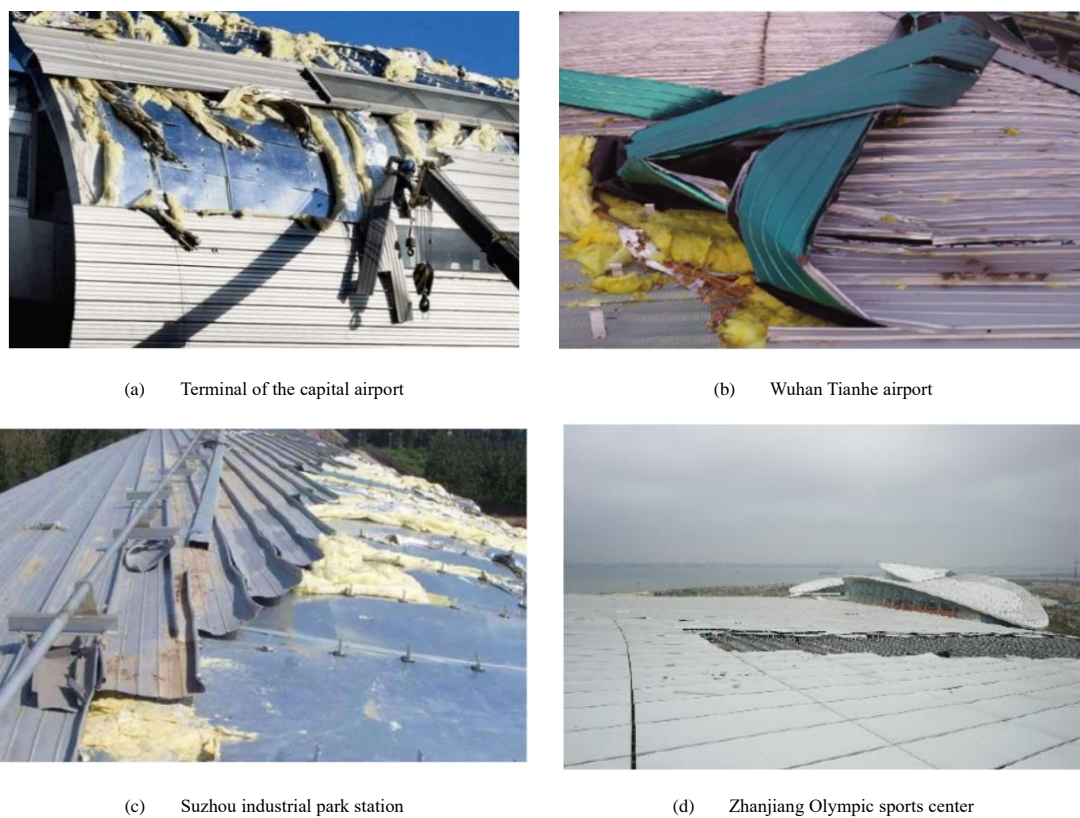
Typical failure modes of metal roofing [48,49]
